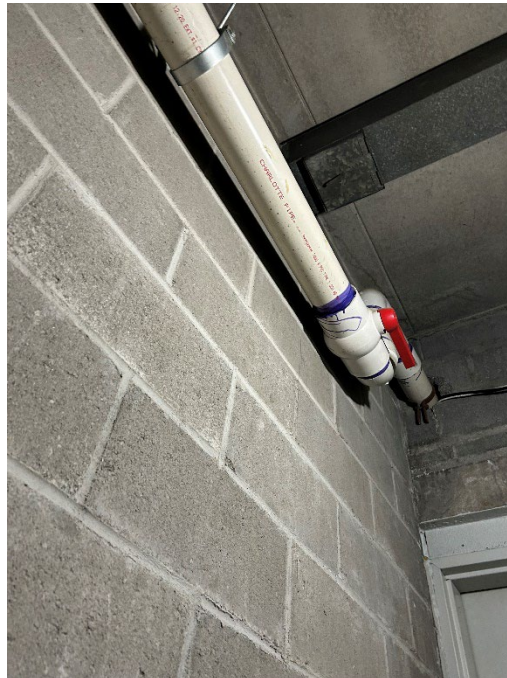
SSDS piping run leading down from the first floor and into the boiler room wall; valve is in the full open position.
